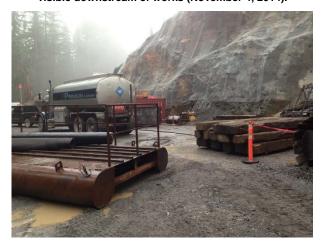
Platforms cleaned on crane pad prior to being installed at diversion tunnel site (November 5, 2014).
